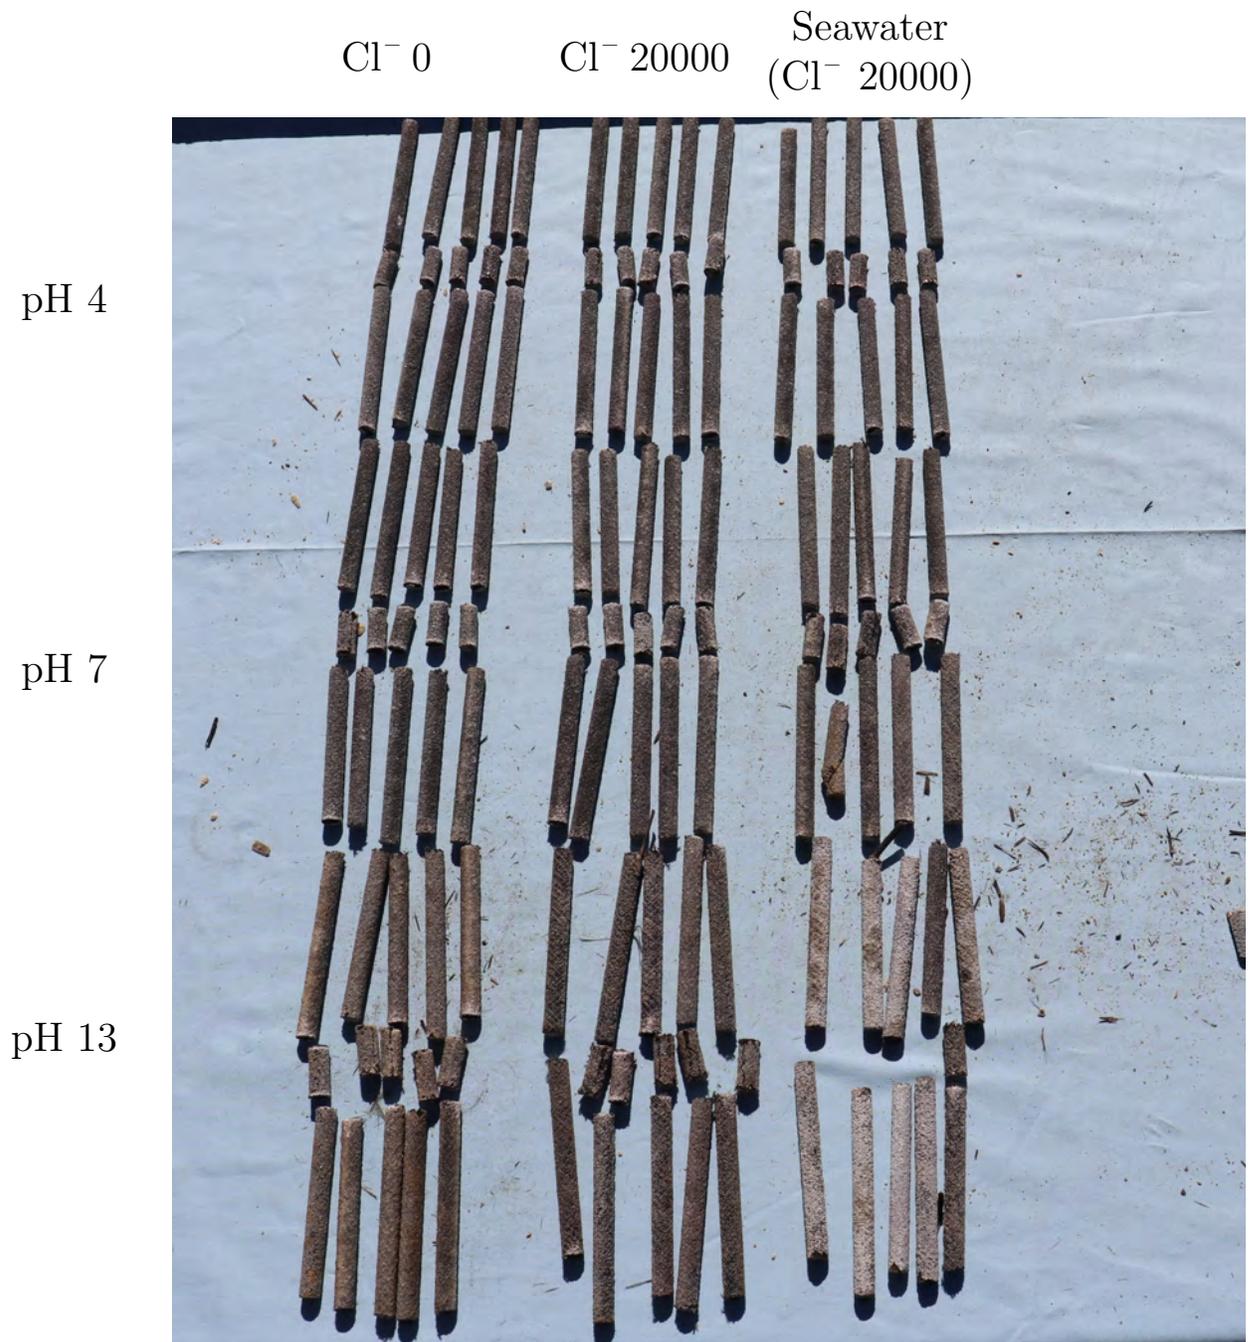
Transverse shear failure mode of Type B #3 rebars
